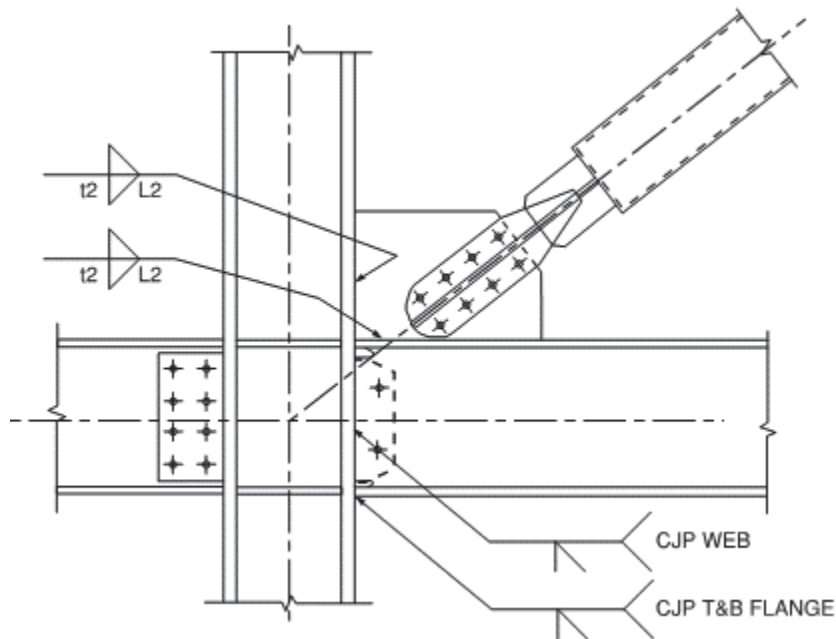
Typical BRBF Beam-Column Moment Connection (SEAOC, 2013)
